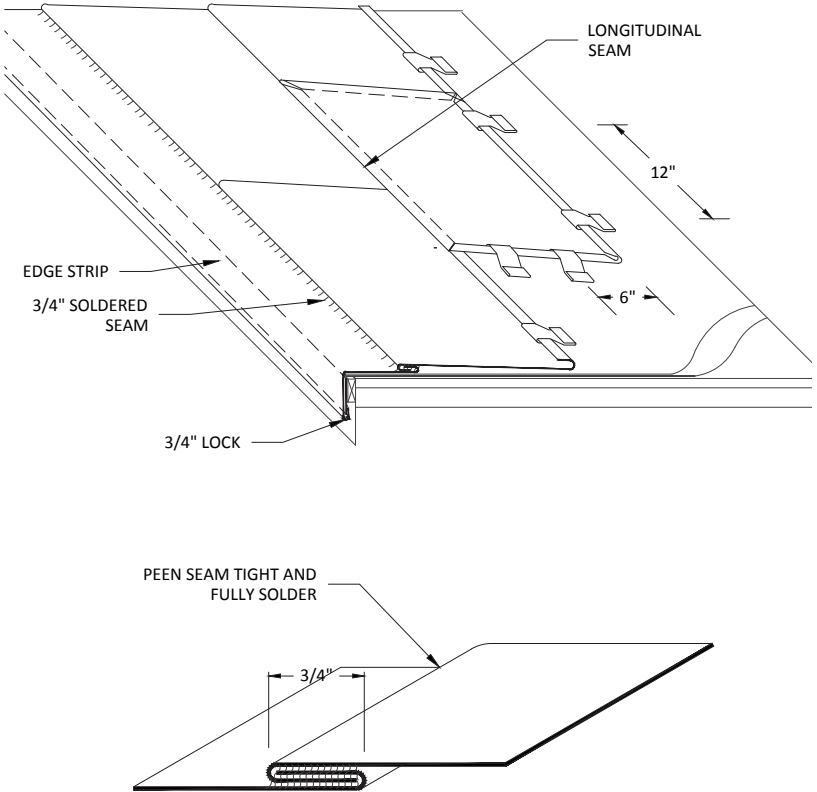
Typical Historic/Traditional Roofing Details Recommended at Areas of Low Slope Roofing.
